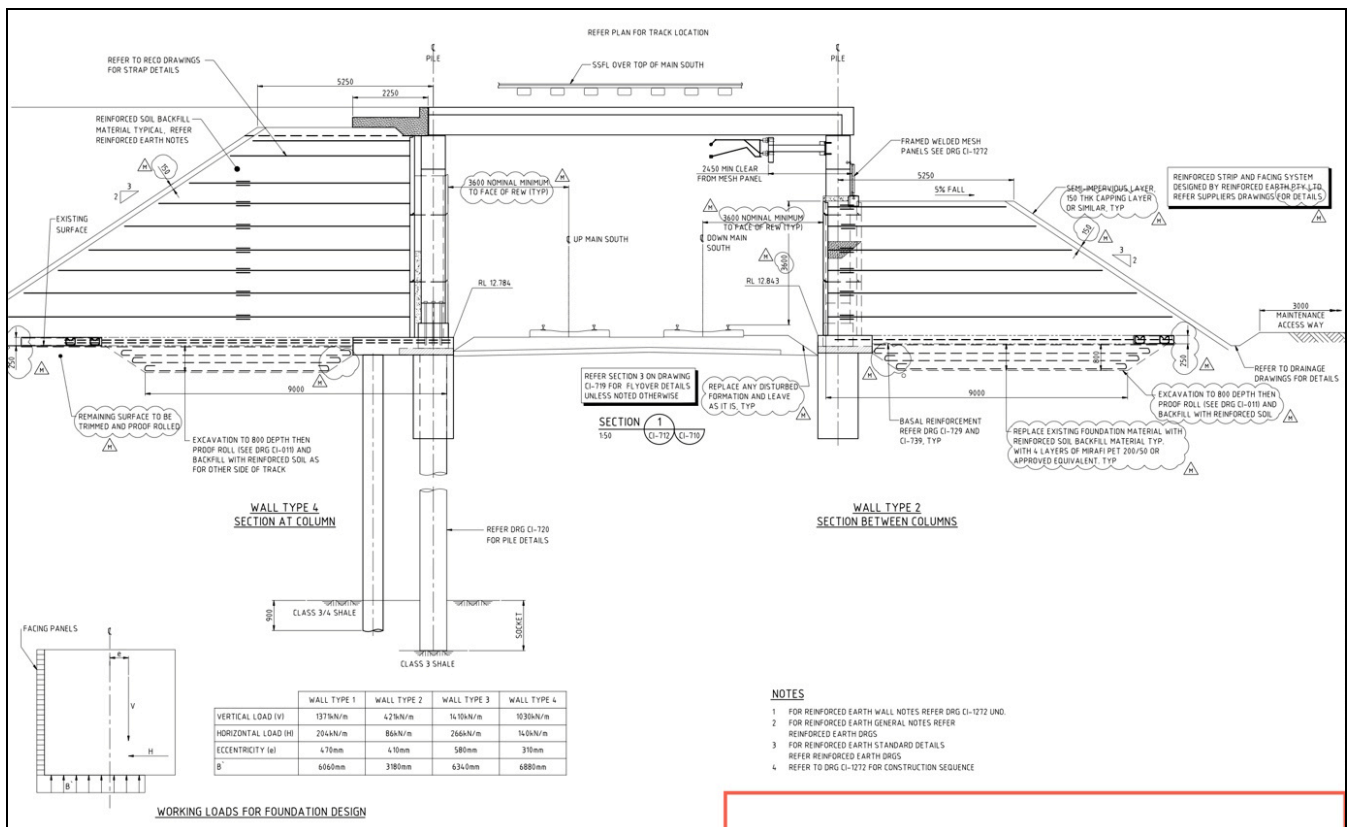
Typical section of abutment structure with embankment section on left-hand side and deflection wall section on right-hand side.
